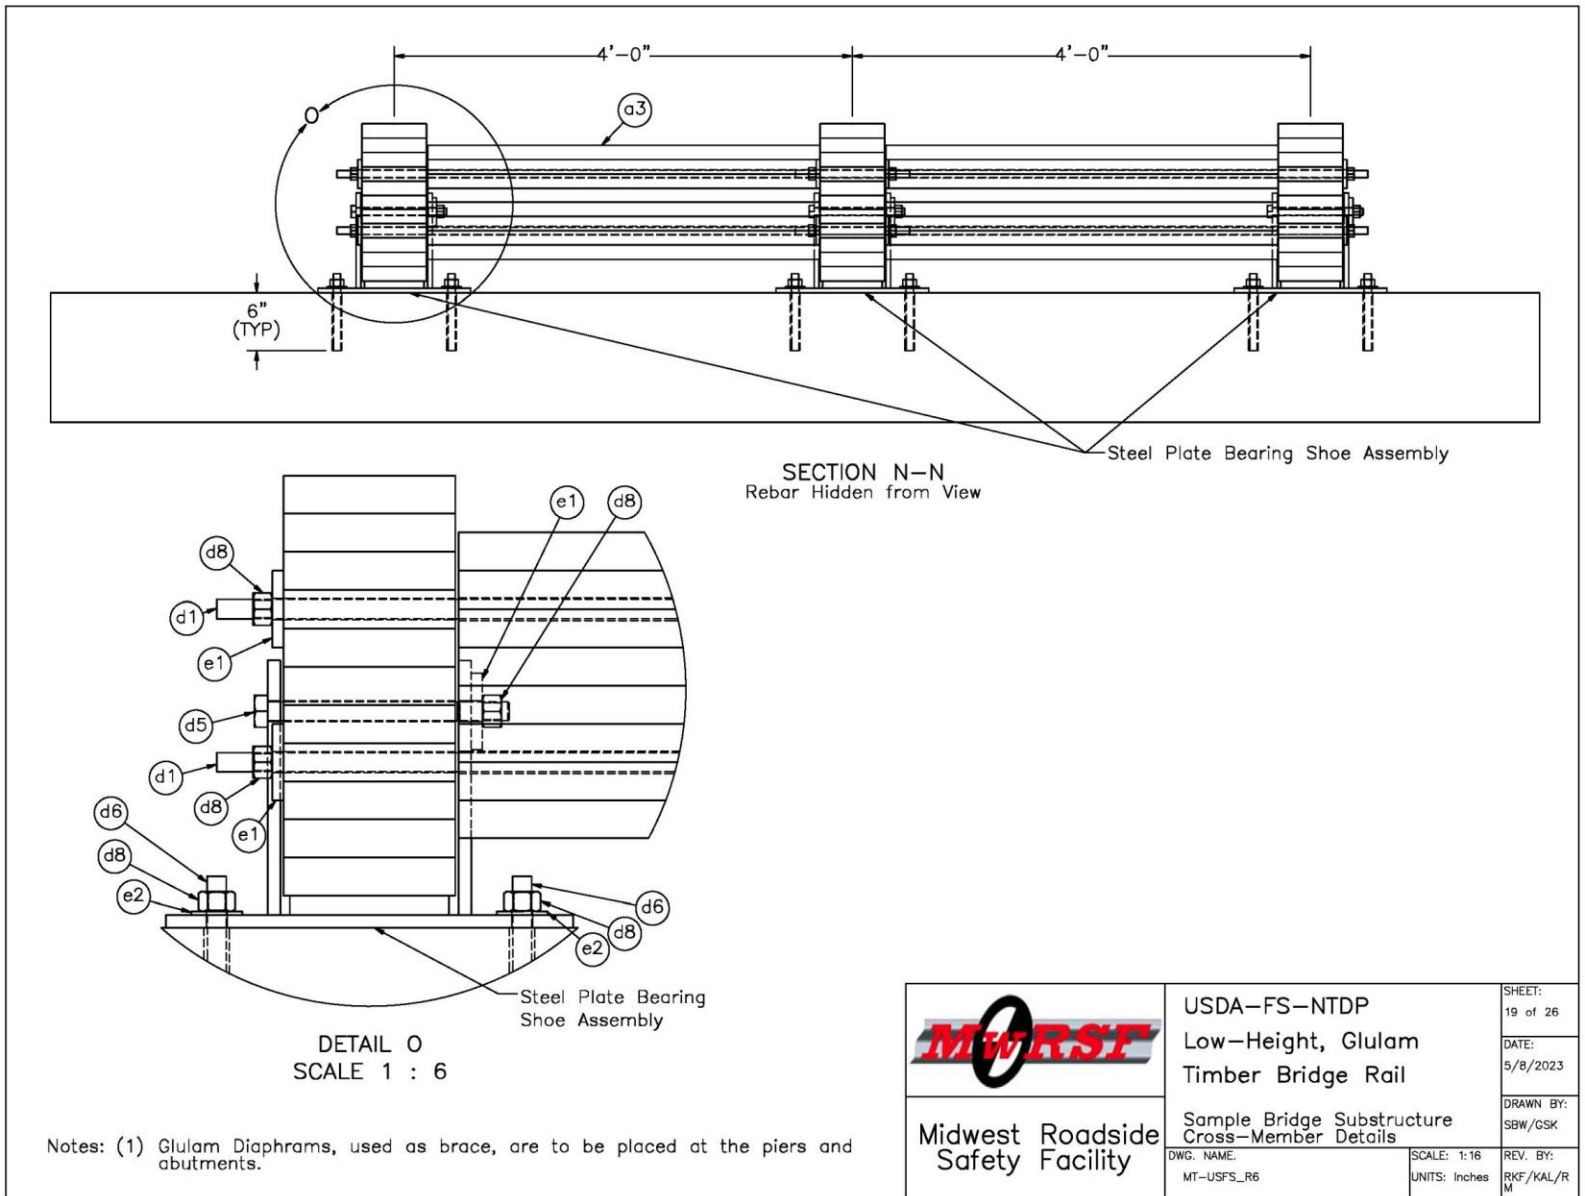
USDA-FS-NTDP Low-Height, Glulam Timber Bridge Rail: Sample Bridge Substructure Cross-Member Details
